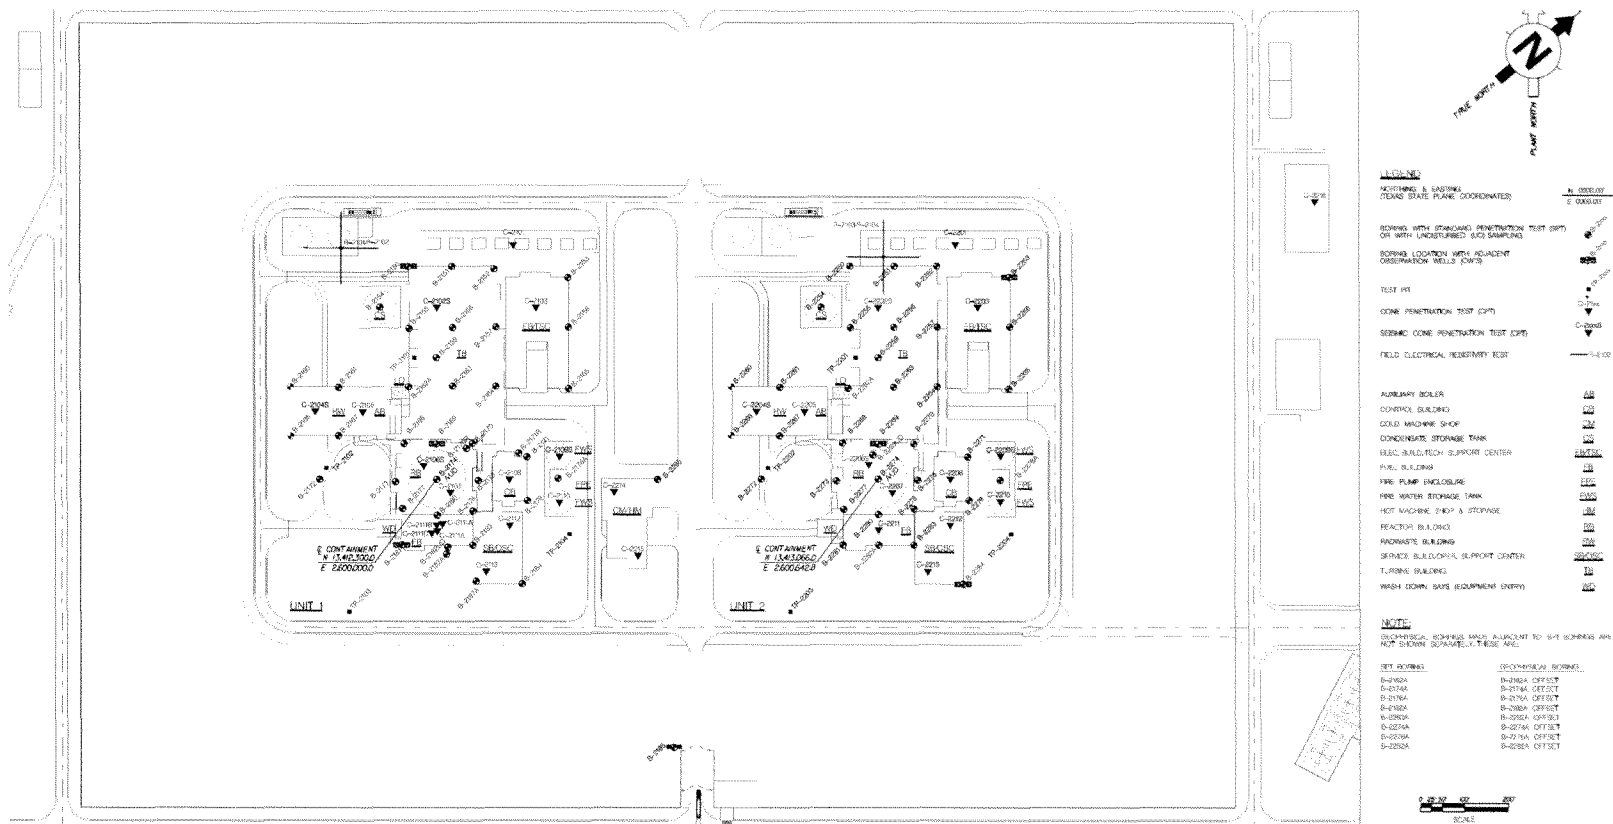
Subsurface Investigation Location Plan (Power Block Area) (Representative Dual Unit ESBWR Layout Shown)
